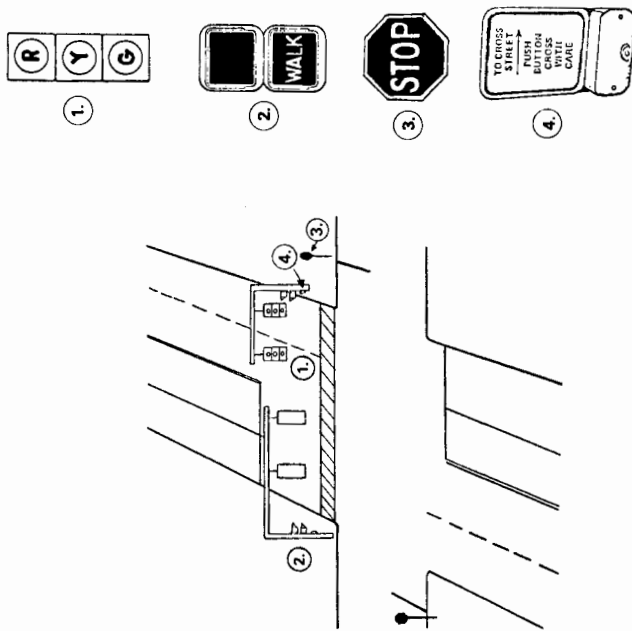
E-2, Flashing Yellow Signal & Flashing Red Beacon
